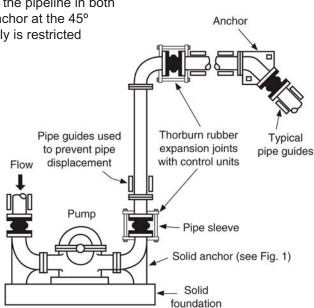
Typical piping layout showing the use of control units with the expansion joints when proper system anchoring is limited
